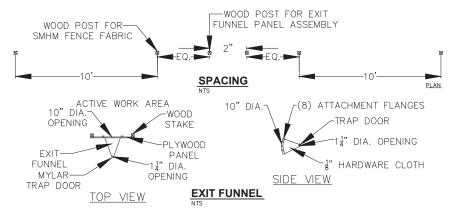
C CONSTRUCTION DETAILS ARDENWOOD CREEK
